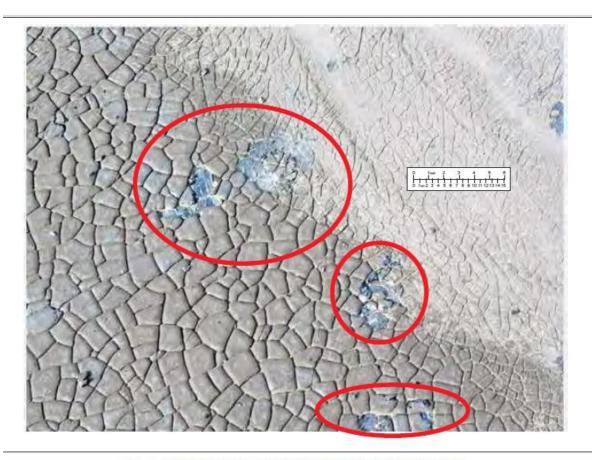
Hail damage to severely "alligatored" roof (built-up roof)
